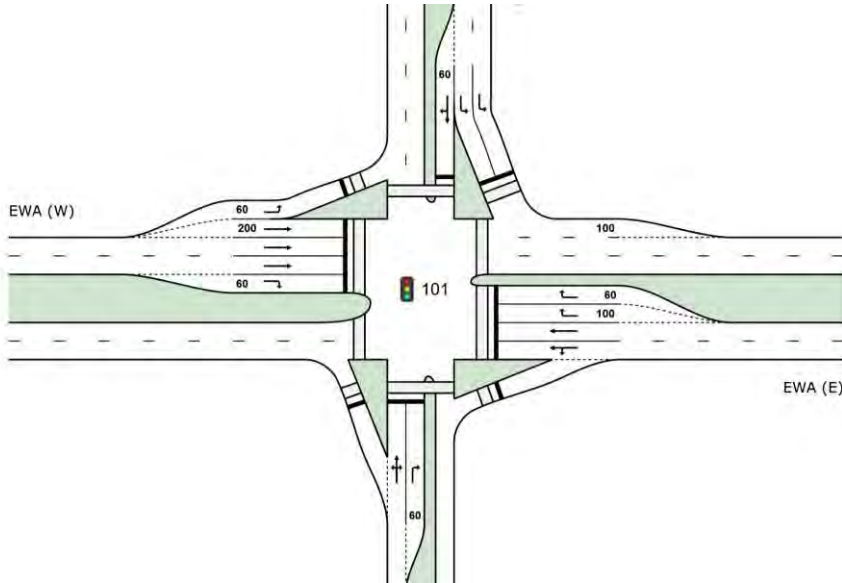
Four-way cross road intersection layout (SIDRA Network schematic)
